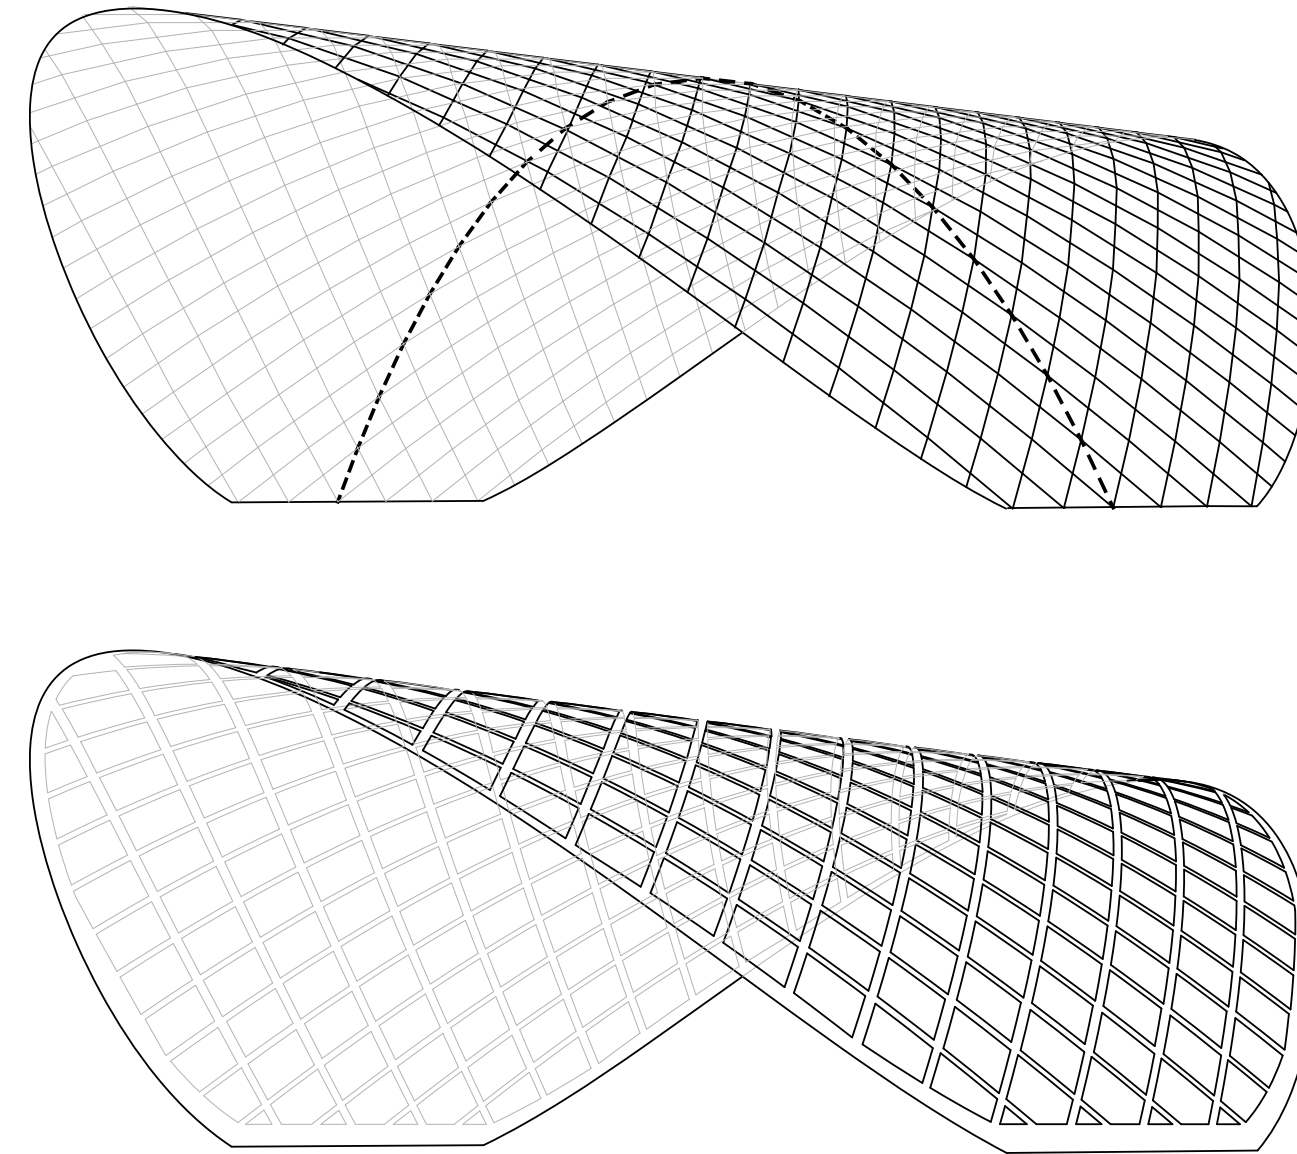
Two definitions of a gridshell structure. Upper drawing - IL 10. lower drawing - Steve Johnson of Edward Cullinan Architects.
